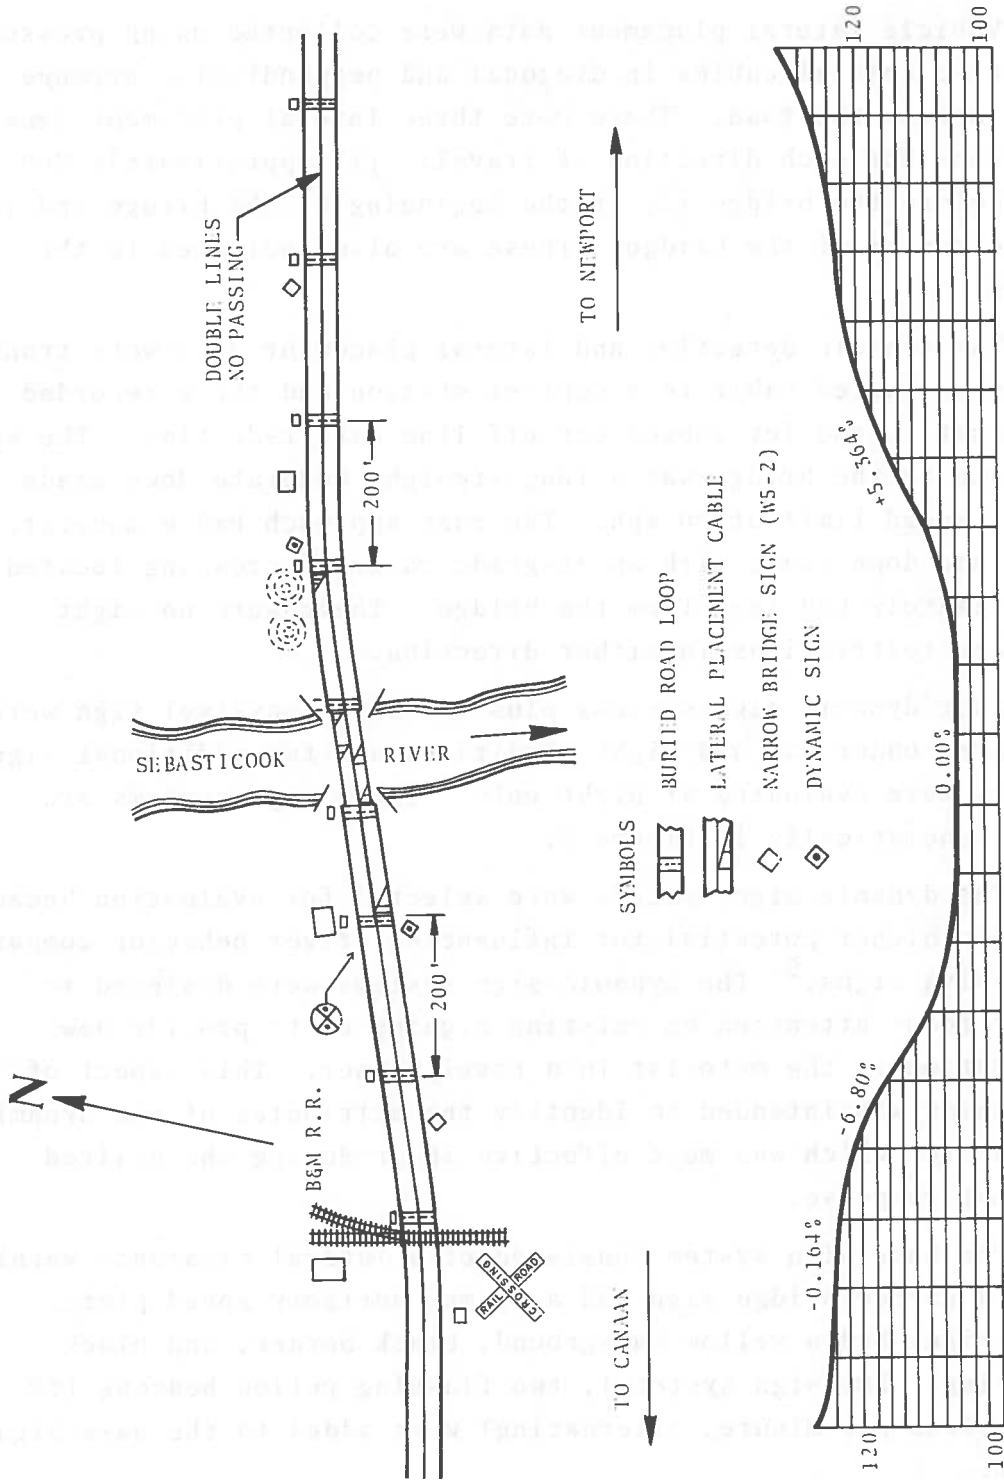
MAINE FACILITY NARROW BRIDGE SITE
